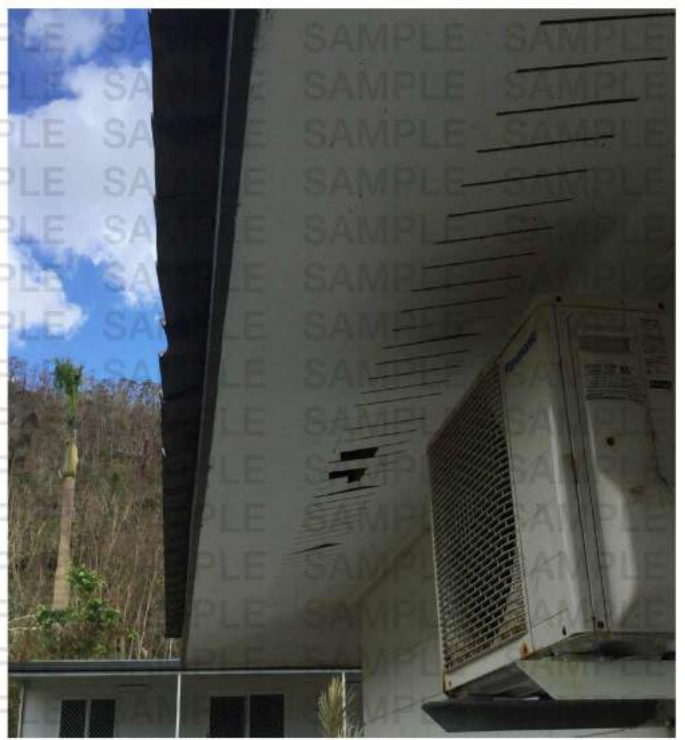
Damaged vented soffit sheeting to main caretakers residence at rear. Nil gutters to roof from existing.
